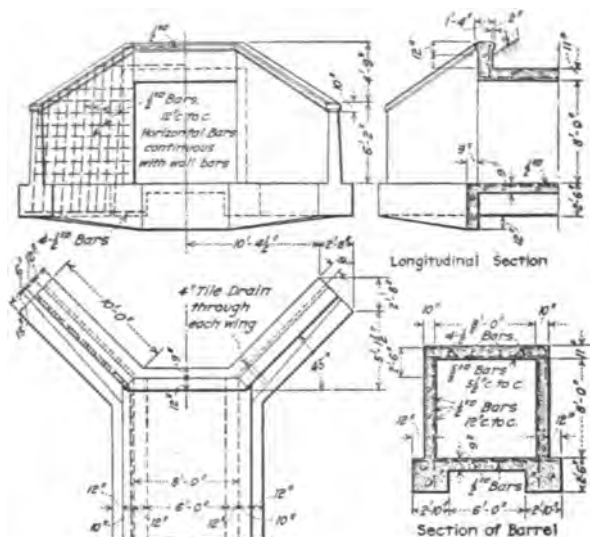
Standard design for 8 X 8-ft. box culvert, Iowa Highway Commission.
